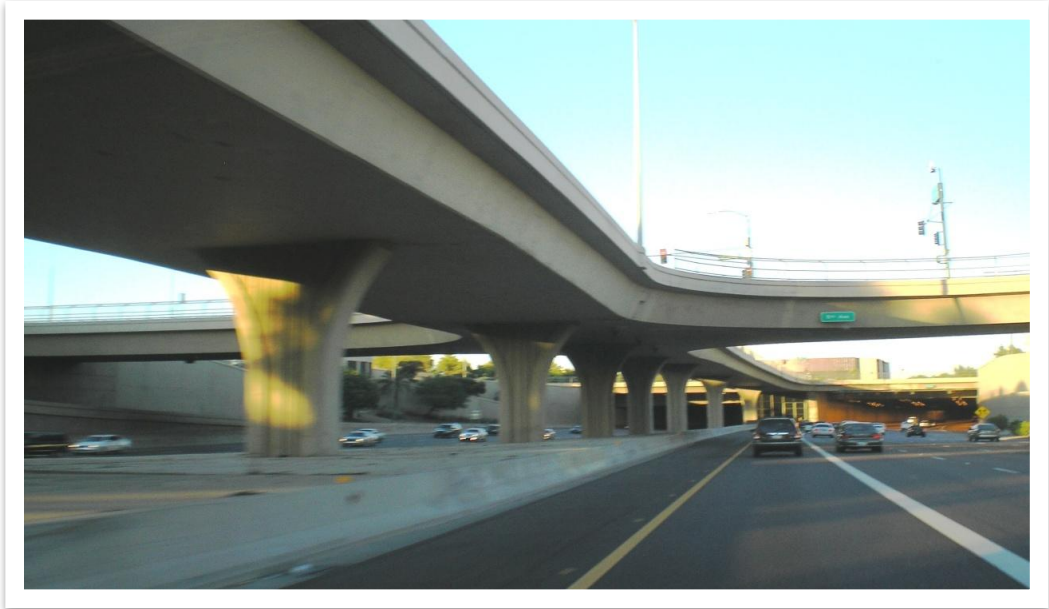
Example of Intersecting Bridges – Overhead View.
